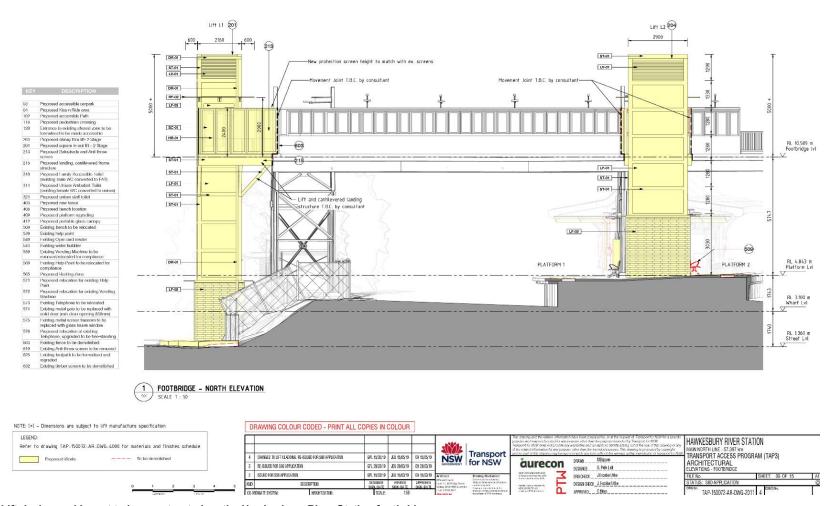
Lift design and layout to be constructed on the Hawkesbury River Station footbridge.
